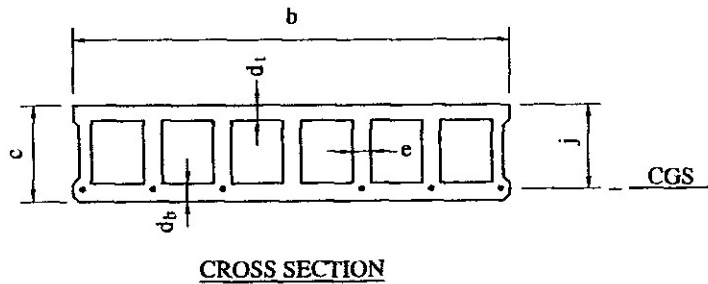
Erection tolerances - hollow core floor and roof members
